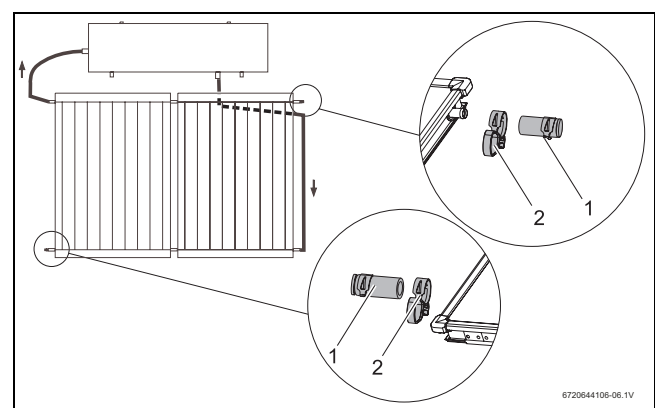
Hose clip with locking ring and pre-assembled dummy plug
